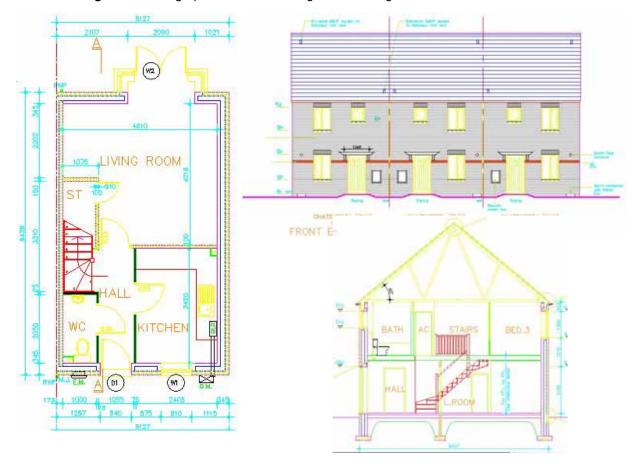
Plan, Elevation and Section Drawings for Bryant "Chatsworth" House Type (Plot 13)
